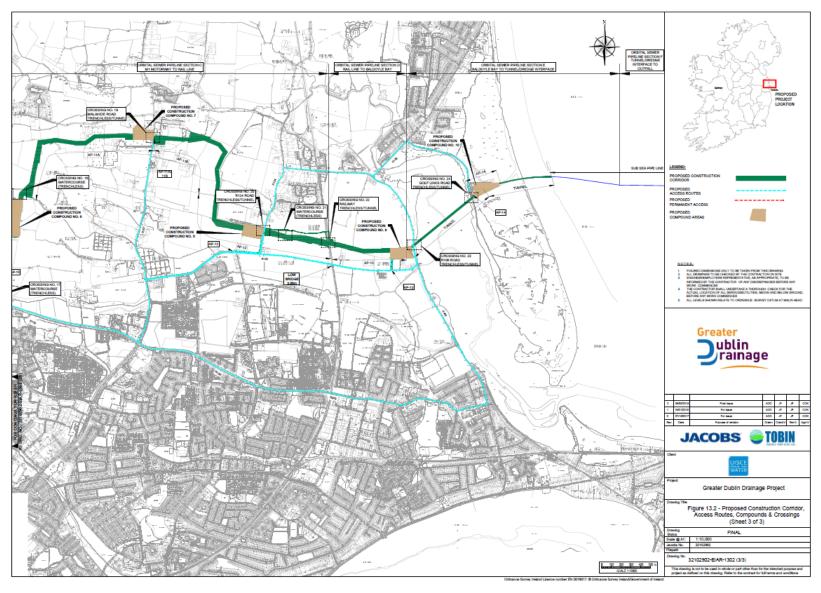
Proposed Construction Corridor, Access Routes, Compounds & Crossings, Sheet (3-3)
